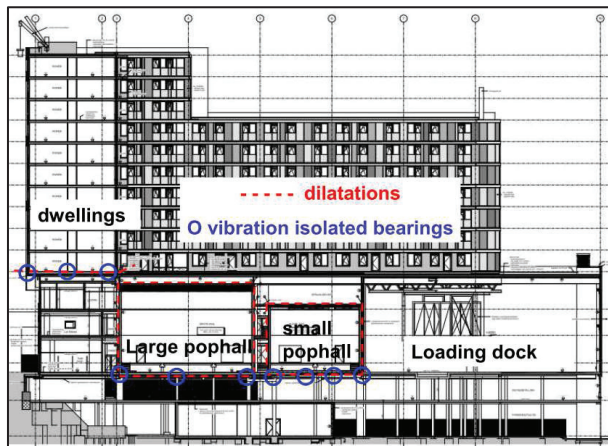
Cross-section through building of Doornroosje, with dwellings above the pop centre.
